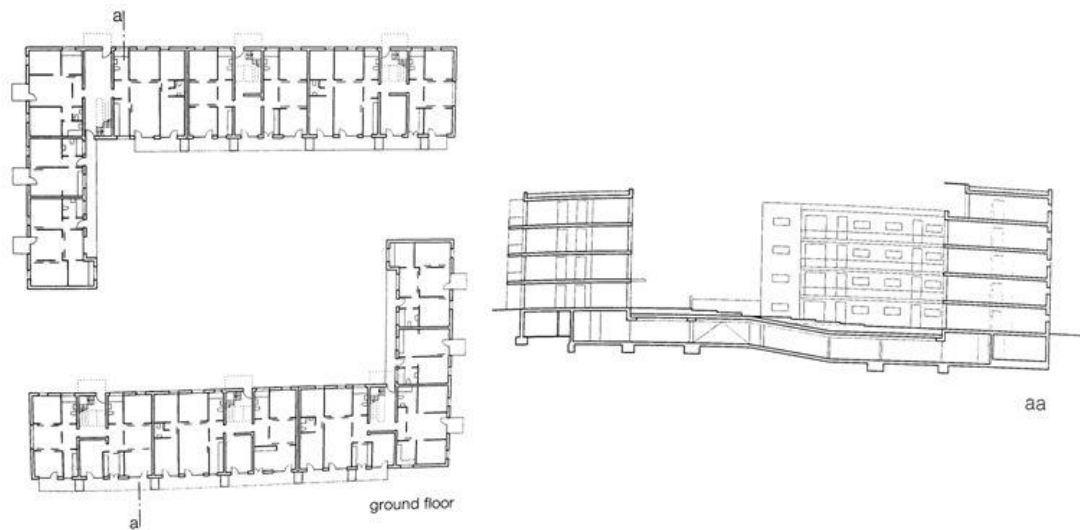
Ground floor plans of Housing development in Wiesbaden and across section
